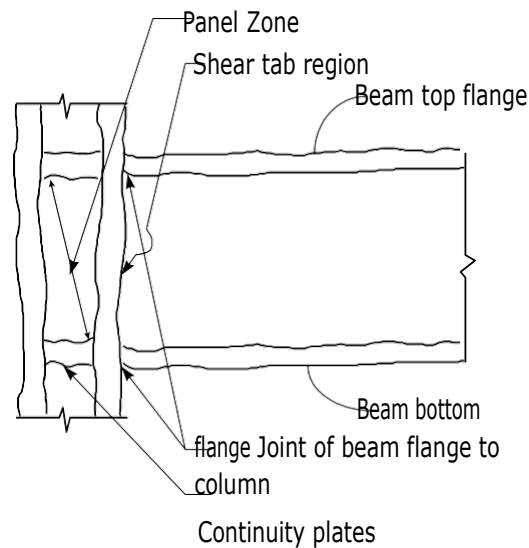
Observation Zones for Fire-Proofed Beam-Column Connections
